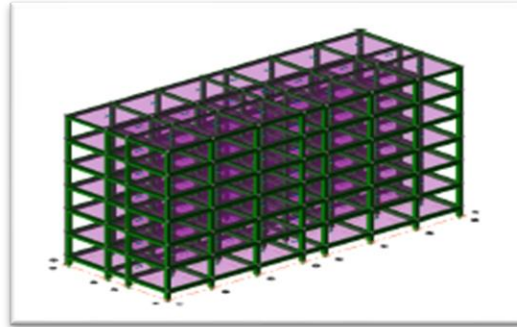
3D view of six storey hospital RC building (Adiyanto *et al.*, 2019)
